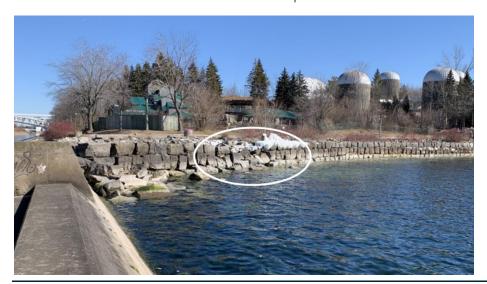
Collapsed portion of stacked armour stone seawall at west shore
